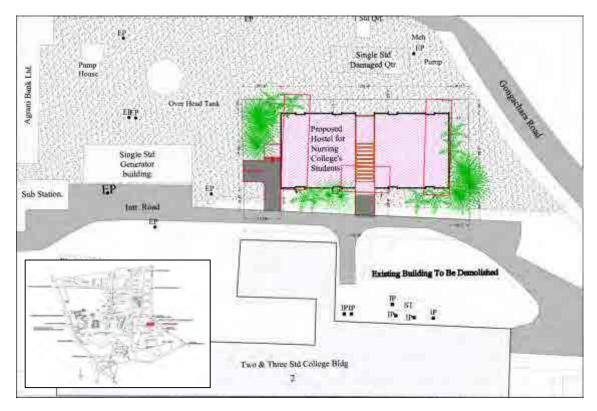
Candidate Site's Location and Layout Plan for Construction of the Nursing College in Rangpur
